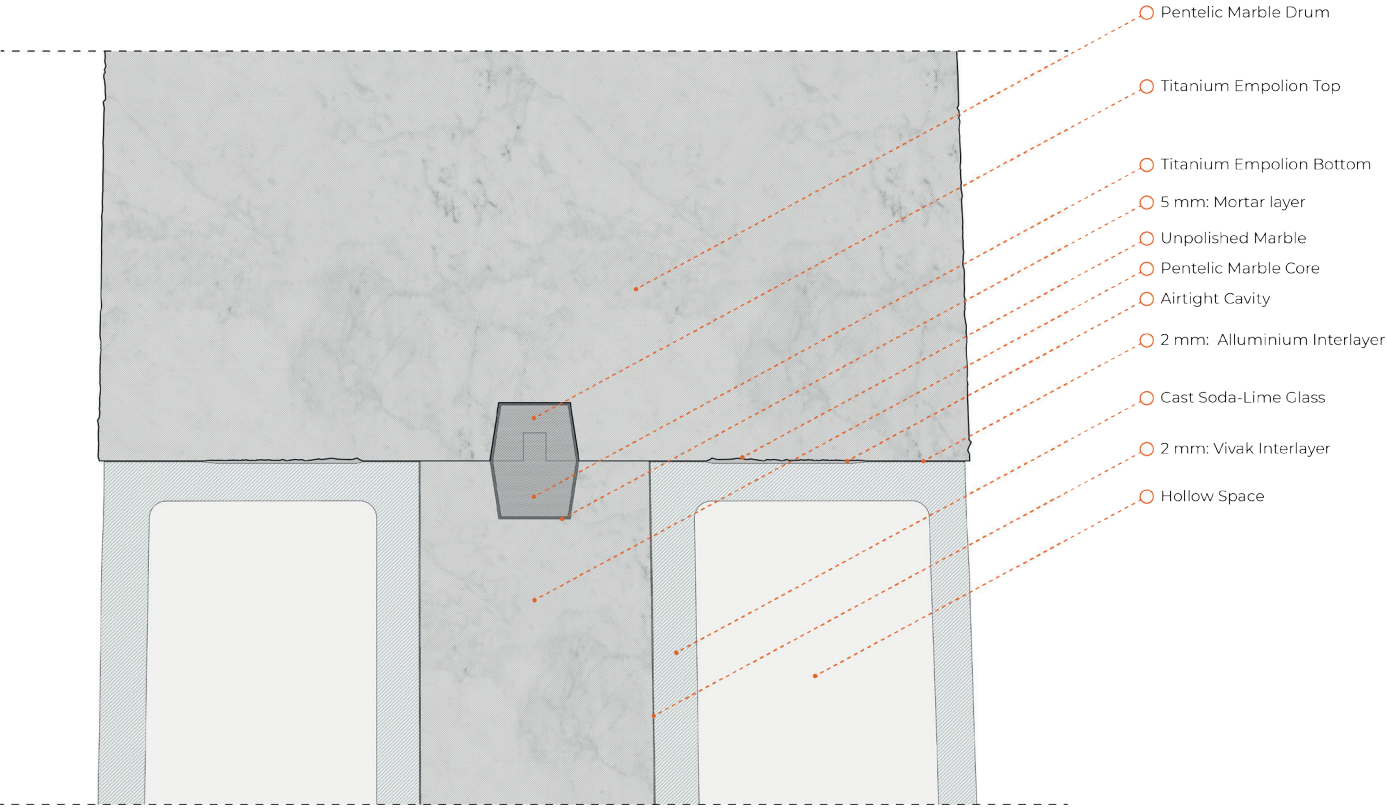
Vertical cross-section of the connection between a marble and glass drum. Scale 1:10
